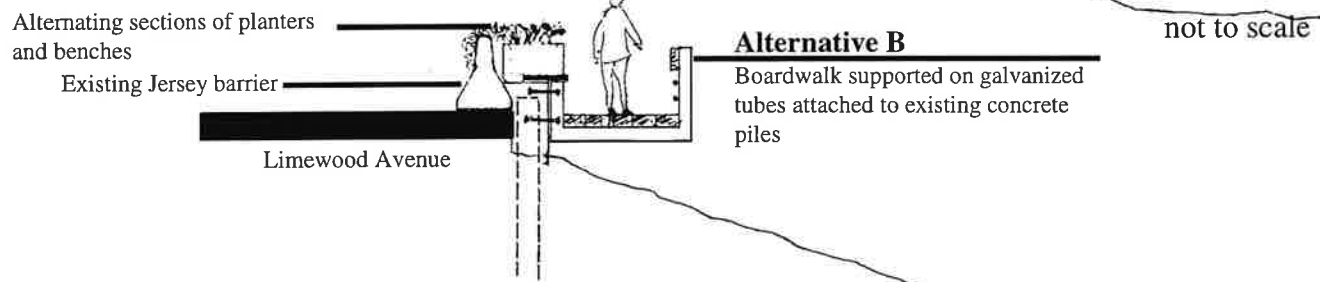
Alternate B, Jersey Barriers remain with boardwalk, benches and planter boxes.
